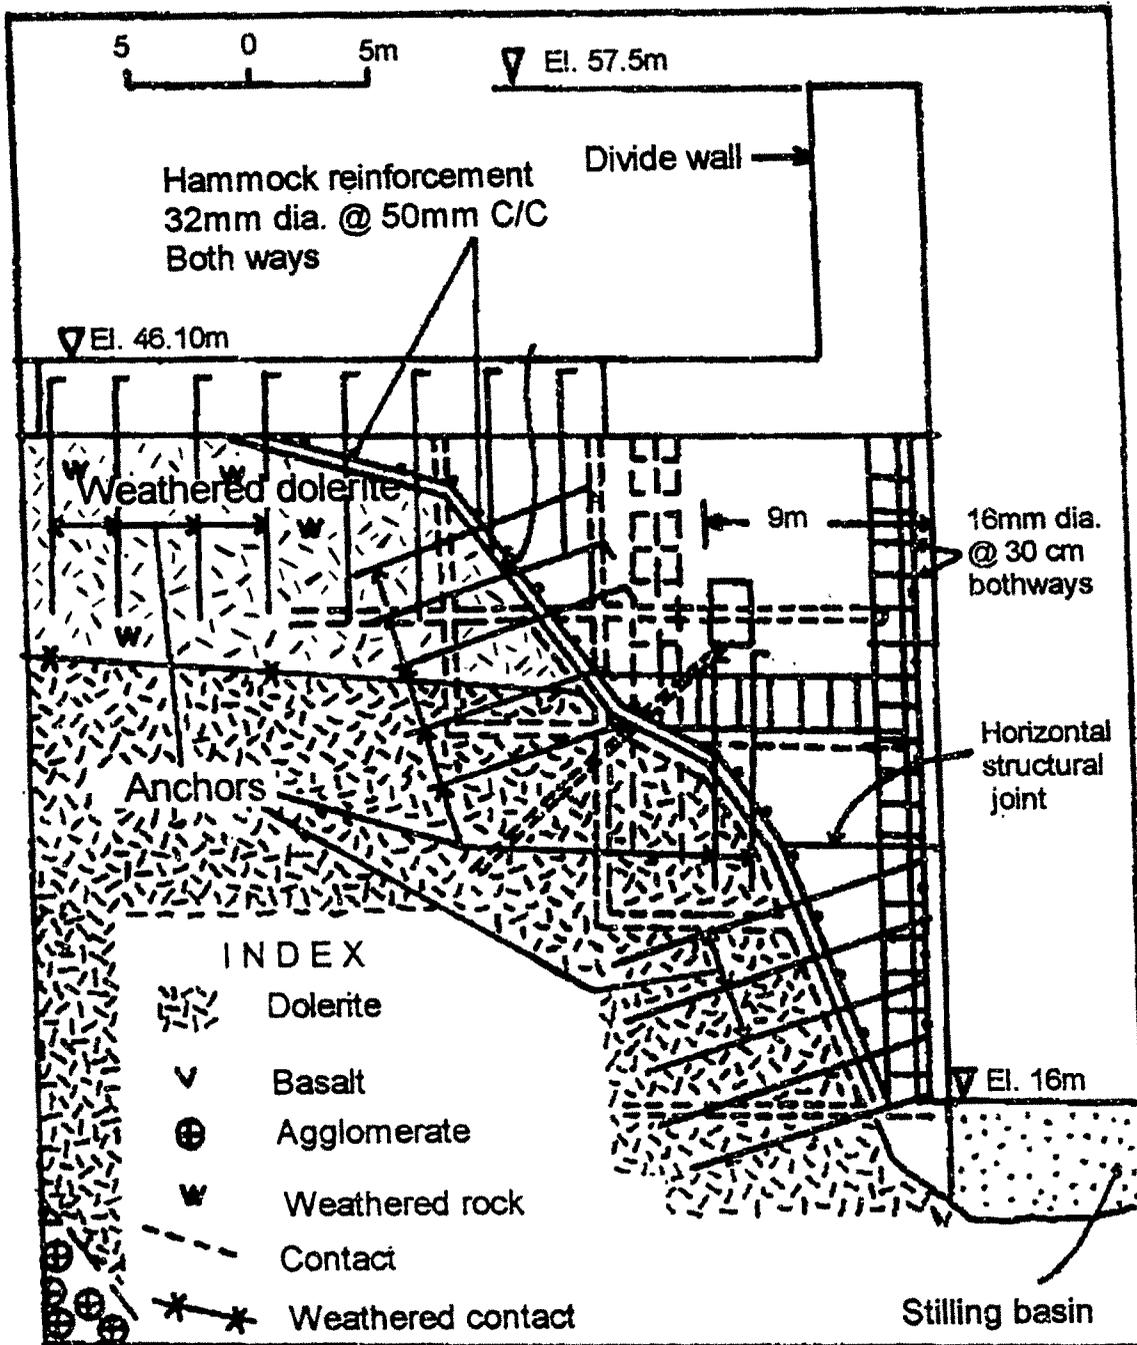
Typical section of Narmada dam left divide wall block-28 showing foundation treatment of scoured rock
